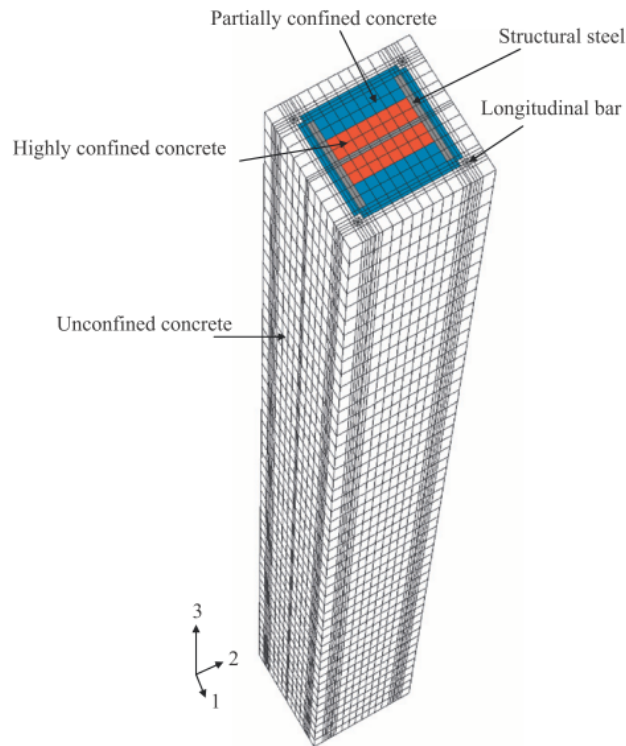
Finite element model of concrete encased steel composite column⁷
